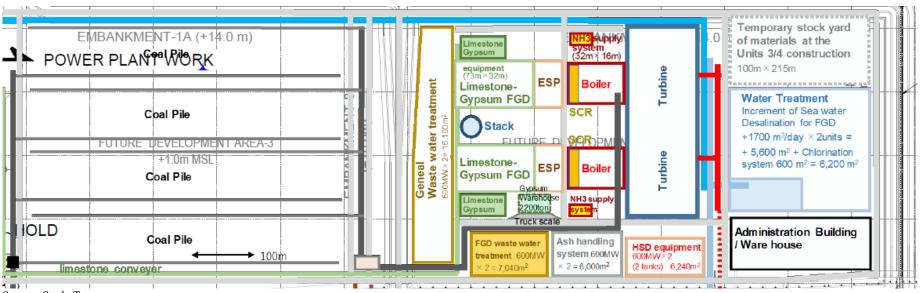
Overall layout plan of Matarbari Coal-fired Power Plant
